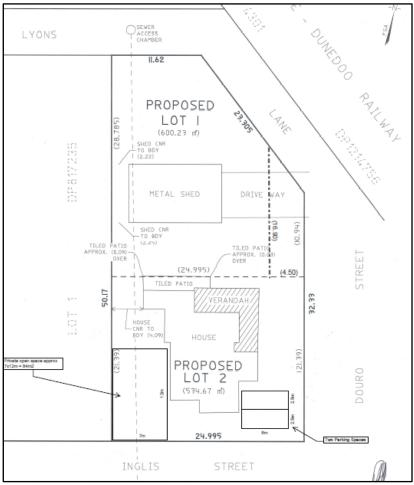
Extract of proposed subdivision plan showing location of private open space and parking within Lot 2.
